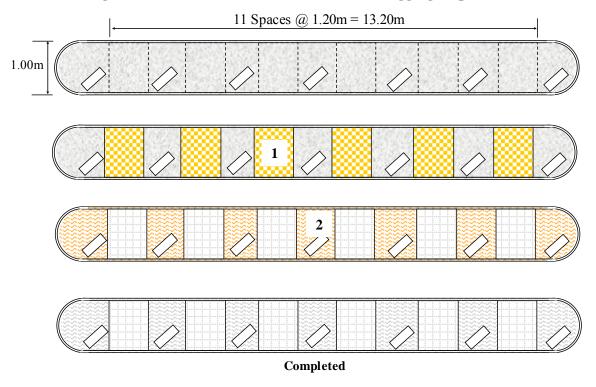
(B) Plan View of FRP Application to Top Faces of Piers
